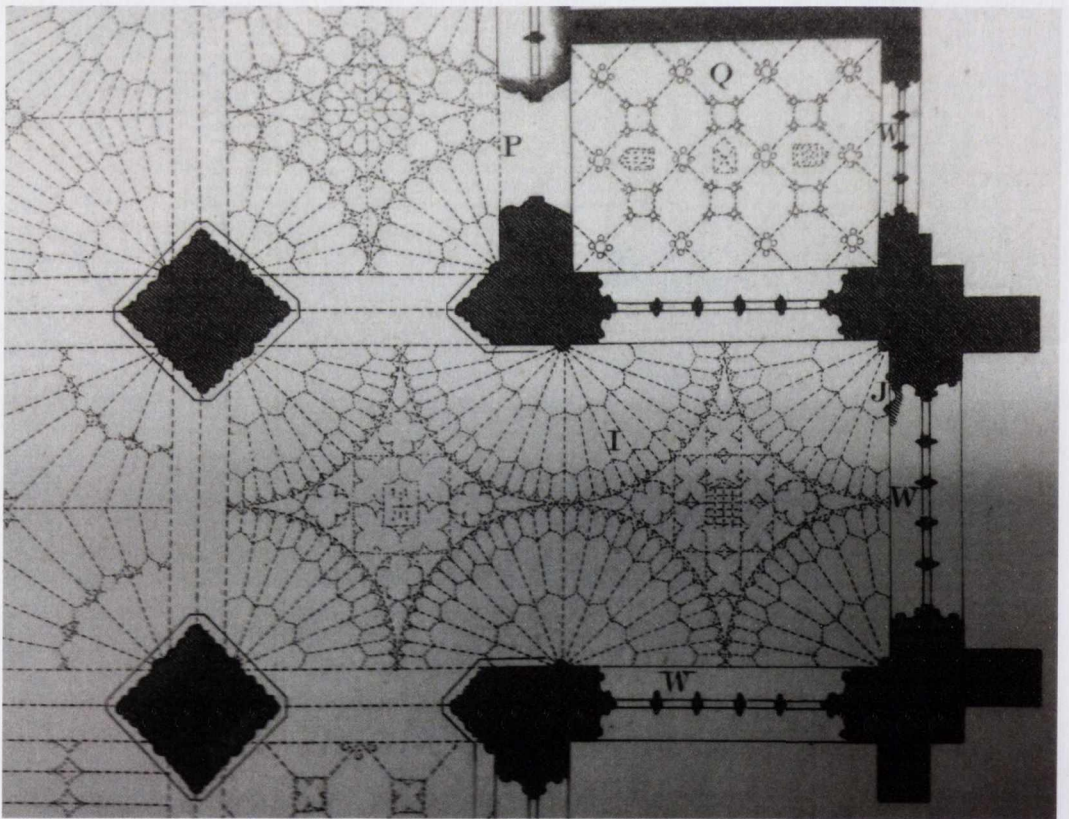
Bath Abbey, detail of south transept and choir aisle plan showing fan vaulting from
